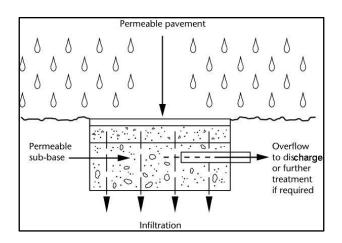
Typical design of permeable pavement (Source: http://www.millermicro.com/porpave.html)
